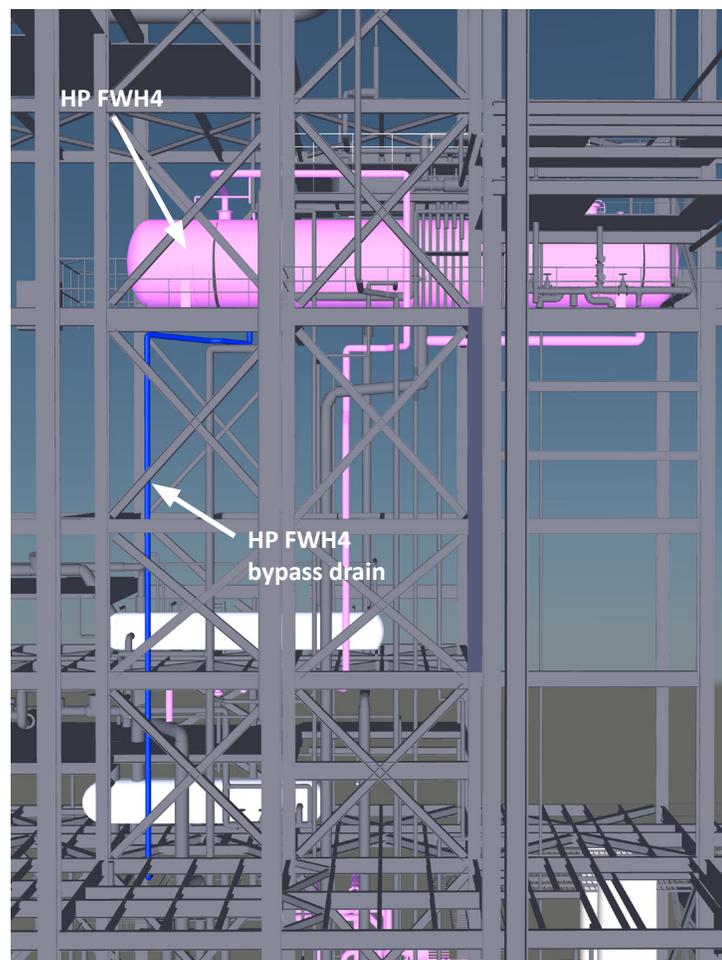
Proposed design and location of the new HP FWH 4 bypass drain (highlighted in blue)
